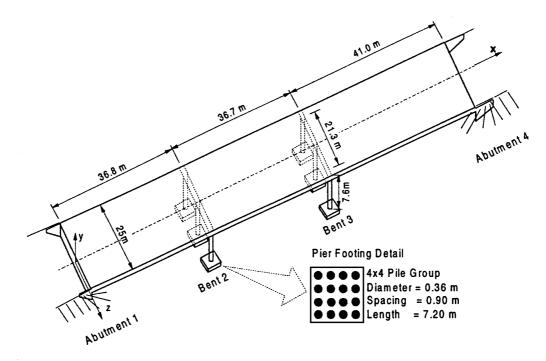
Three span box girder bridge on pile foundations (after (27)).
